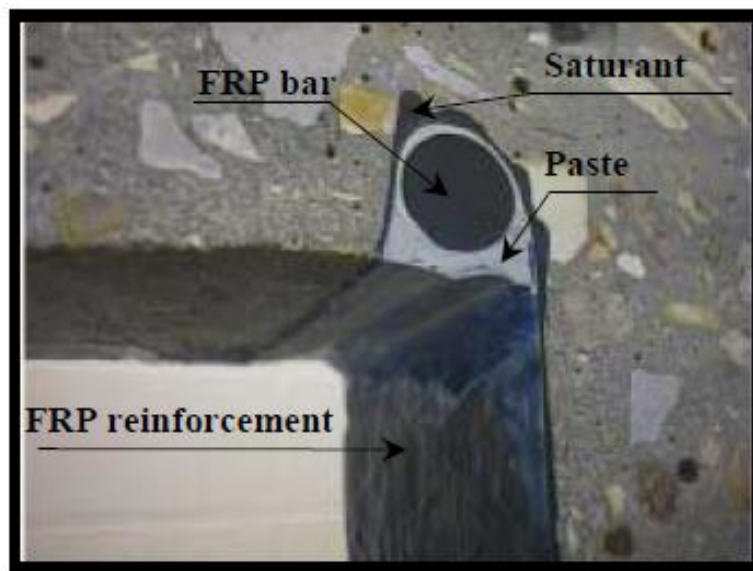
Cut-away section of U-Anchor installed at web flange junction (Khalifa et al., 1999)
